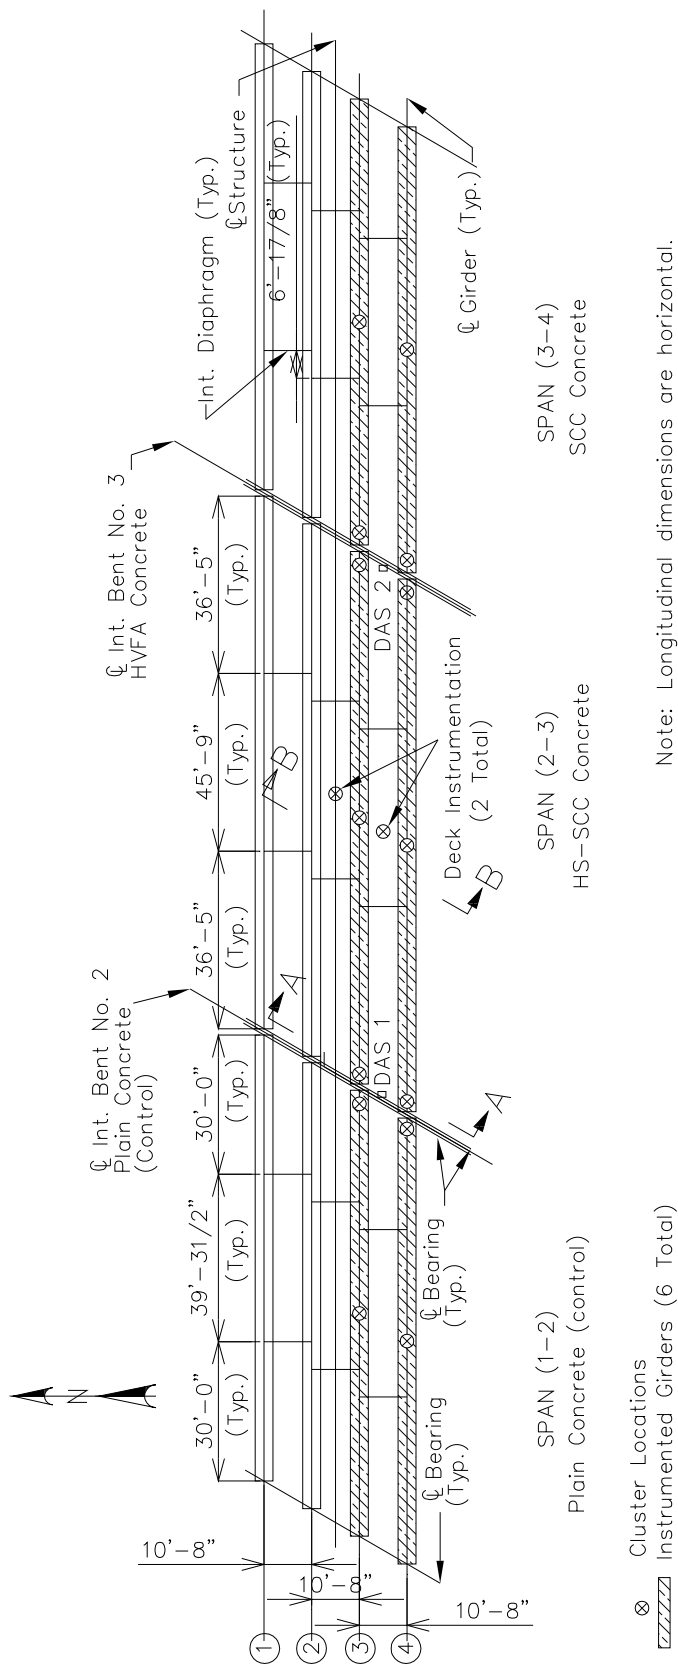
Plan Illustrating Girders to be Instrumented and “Cluster” Locations
